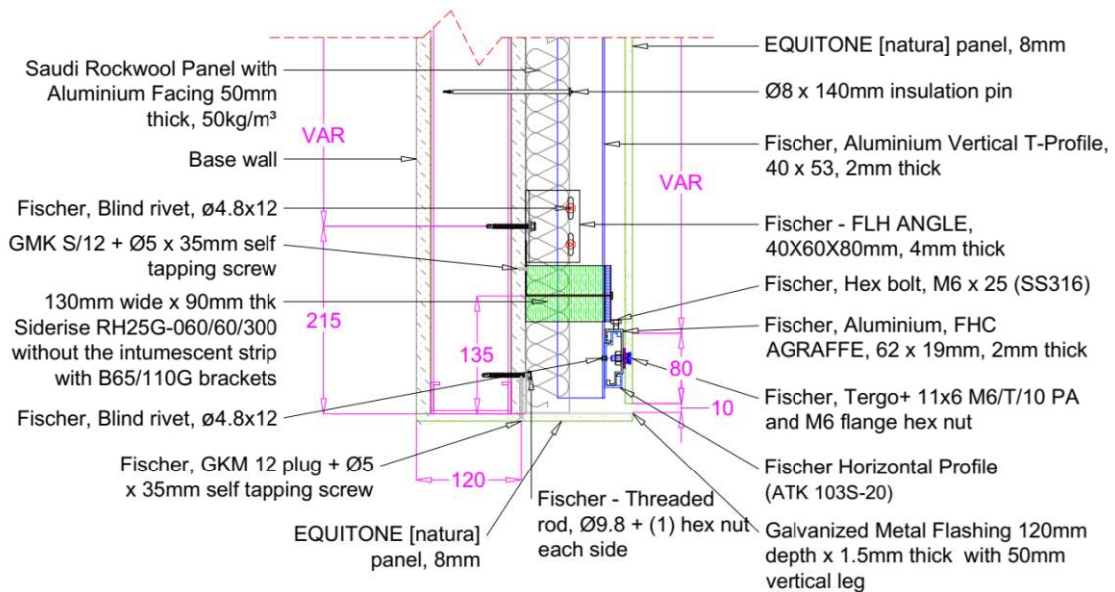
Fibre Cement Board, 8mm thick EQUITONE [natura] in External Wall System/Assembly
